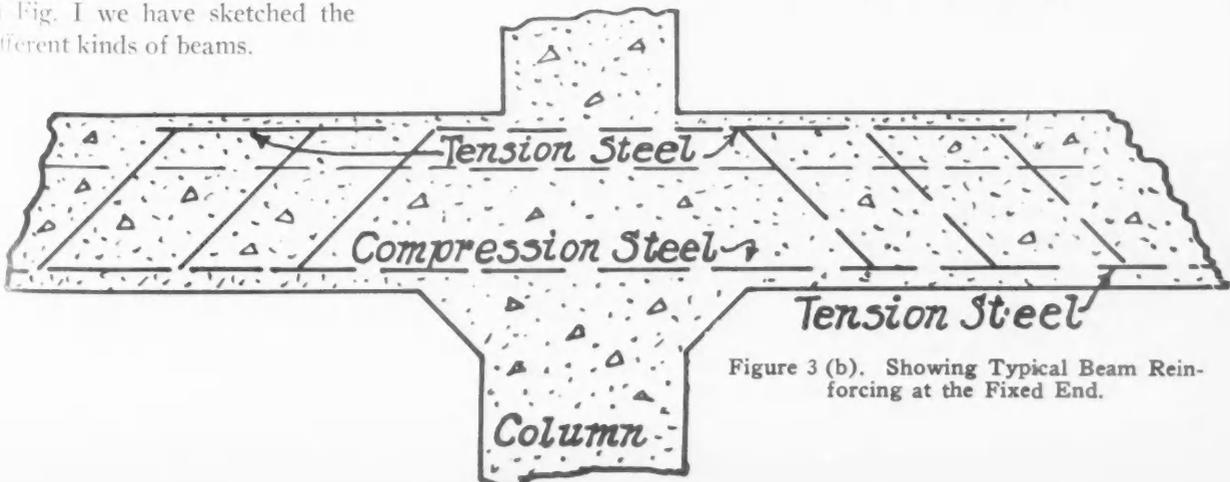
(b). Showing Typical Beam Reinforcing at the Fixed End.
